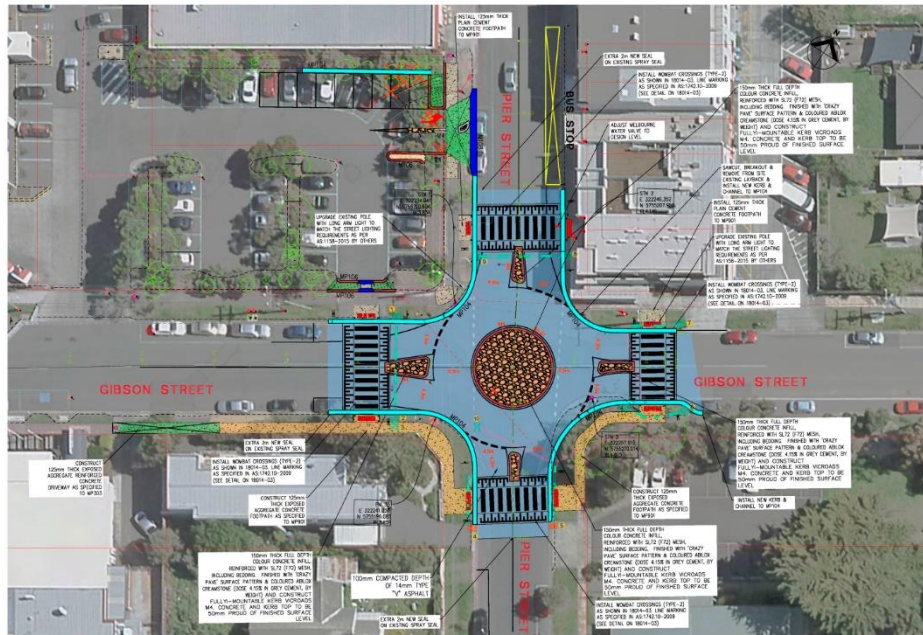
(d). Proposed compact roundabout for local residential road intersection, type 1.
